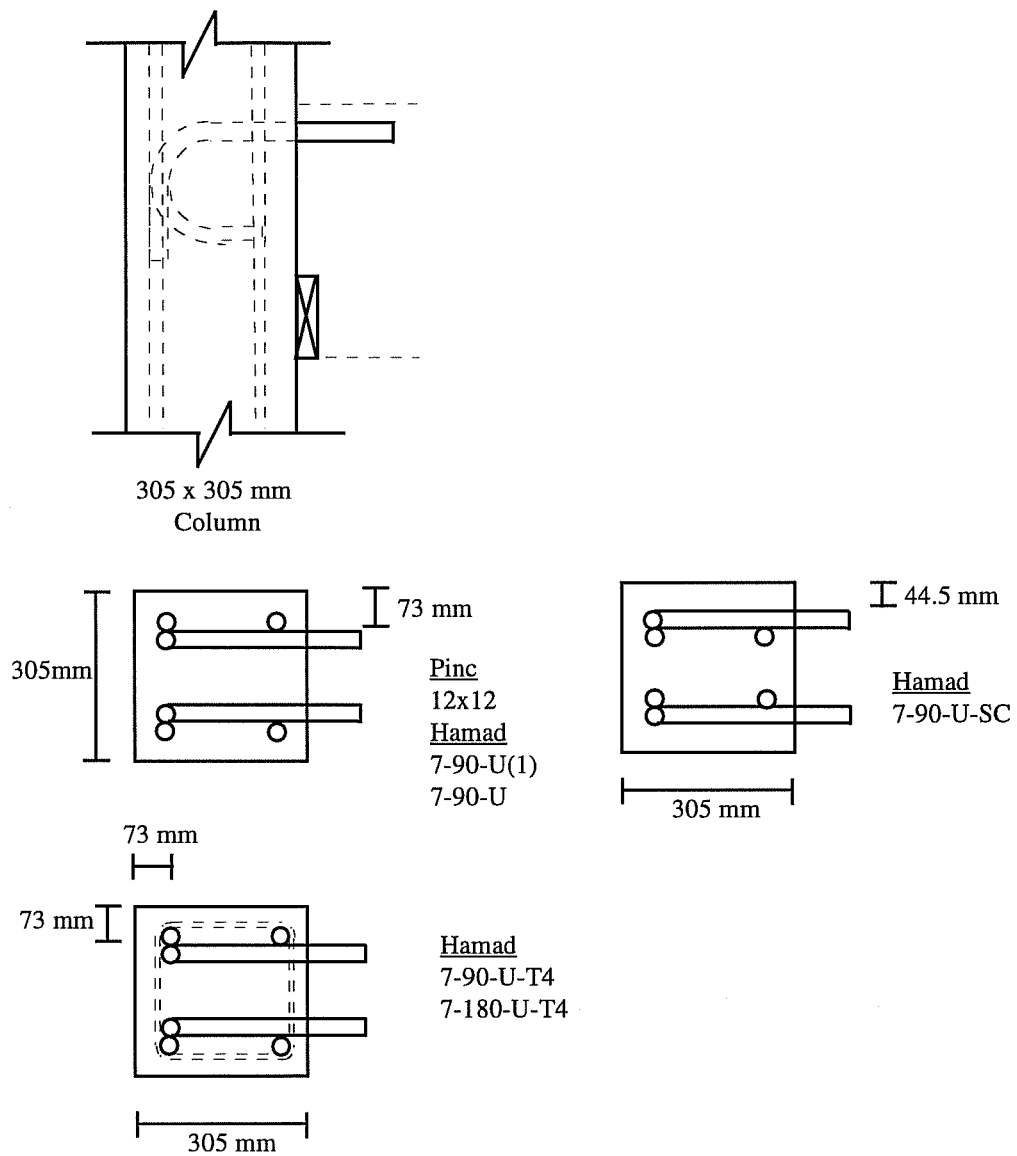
Joint details of the #7 Hooked Bar Specimens by Pinc [11] and Hamad [12]
